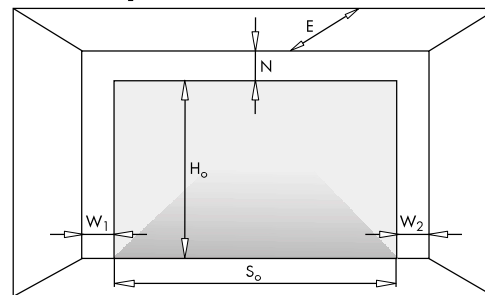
The assembly dimensions and their marking required for correct selection and assembly of WIŚNIEWSKI sectional garage doors. Minimum door size  $S_o = 2000$  [mm] and  $H_o = 1900$  [mm].
